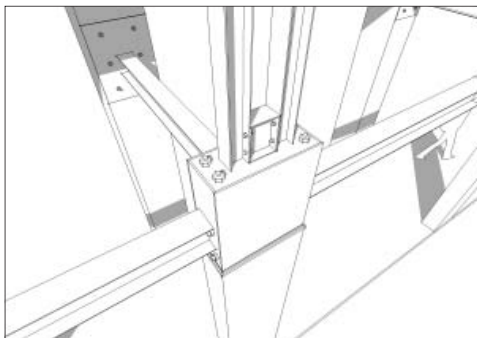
New Church Street Concrete and Steel Composite Support Structure
